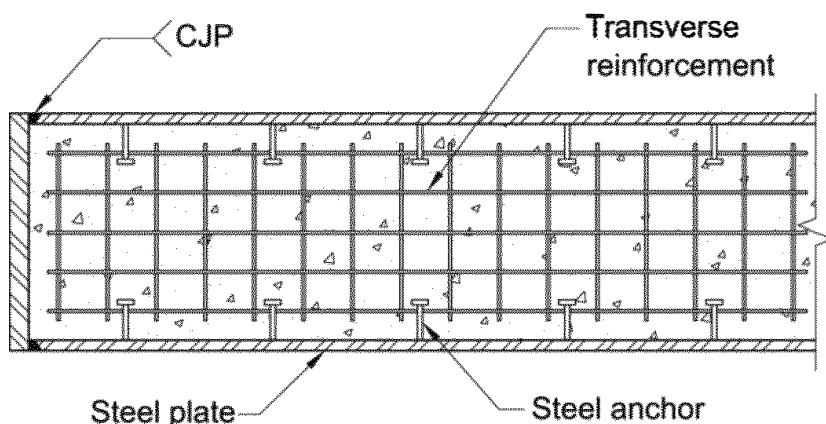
Concrete filled C-PSW with transverse reinforcement to provide integrity of the concrete infill.
